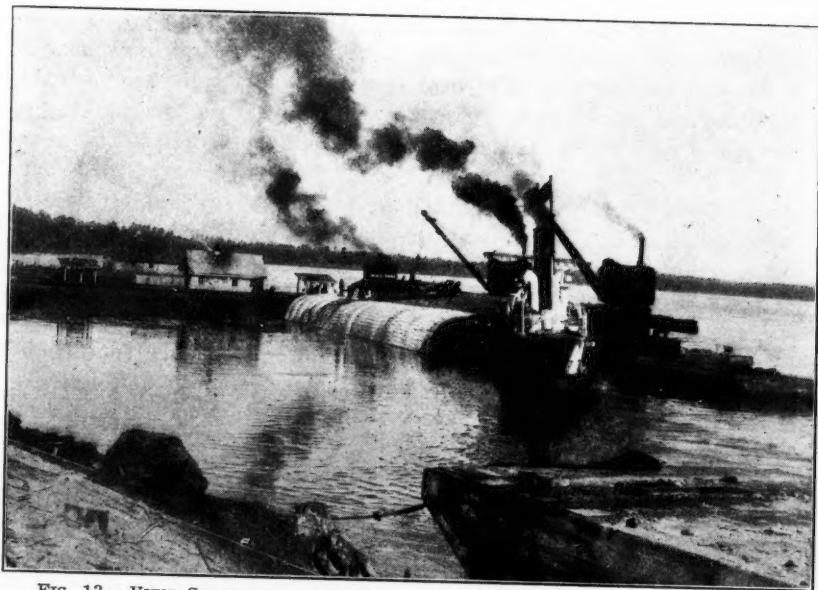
VIEW SHOWING THE LAYING OF AN ARTICULATED CONCRETE MATTRESS.
